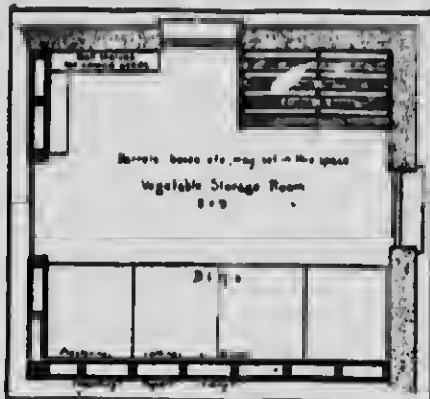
Plan of Storage Room in a corner of the basement of the dwelling house. The arrangement of the shelves and bins may be changed to suit the conditions.
